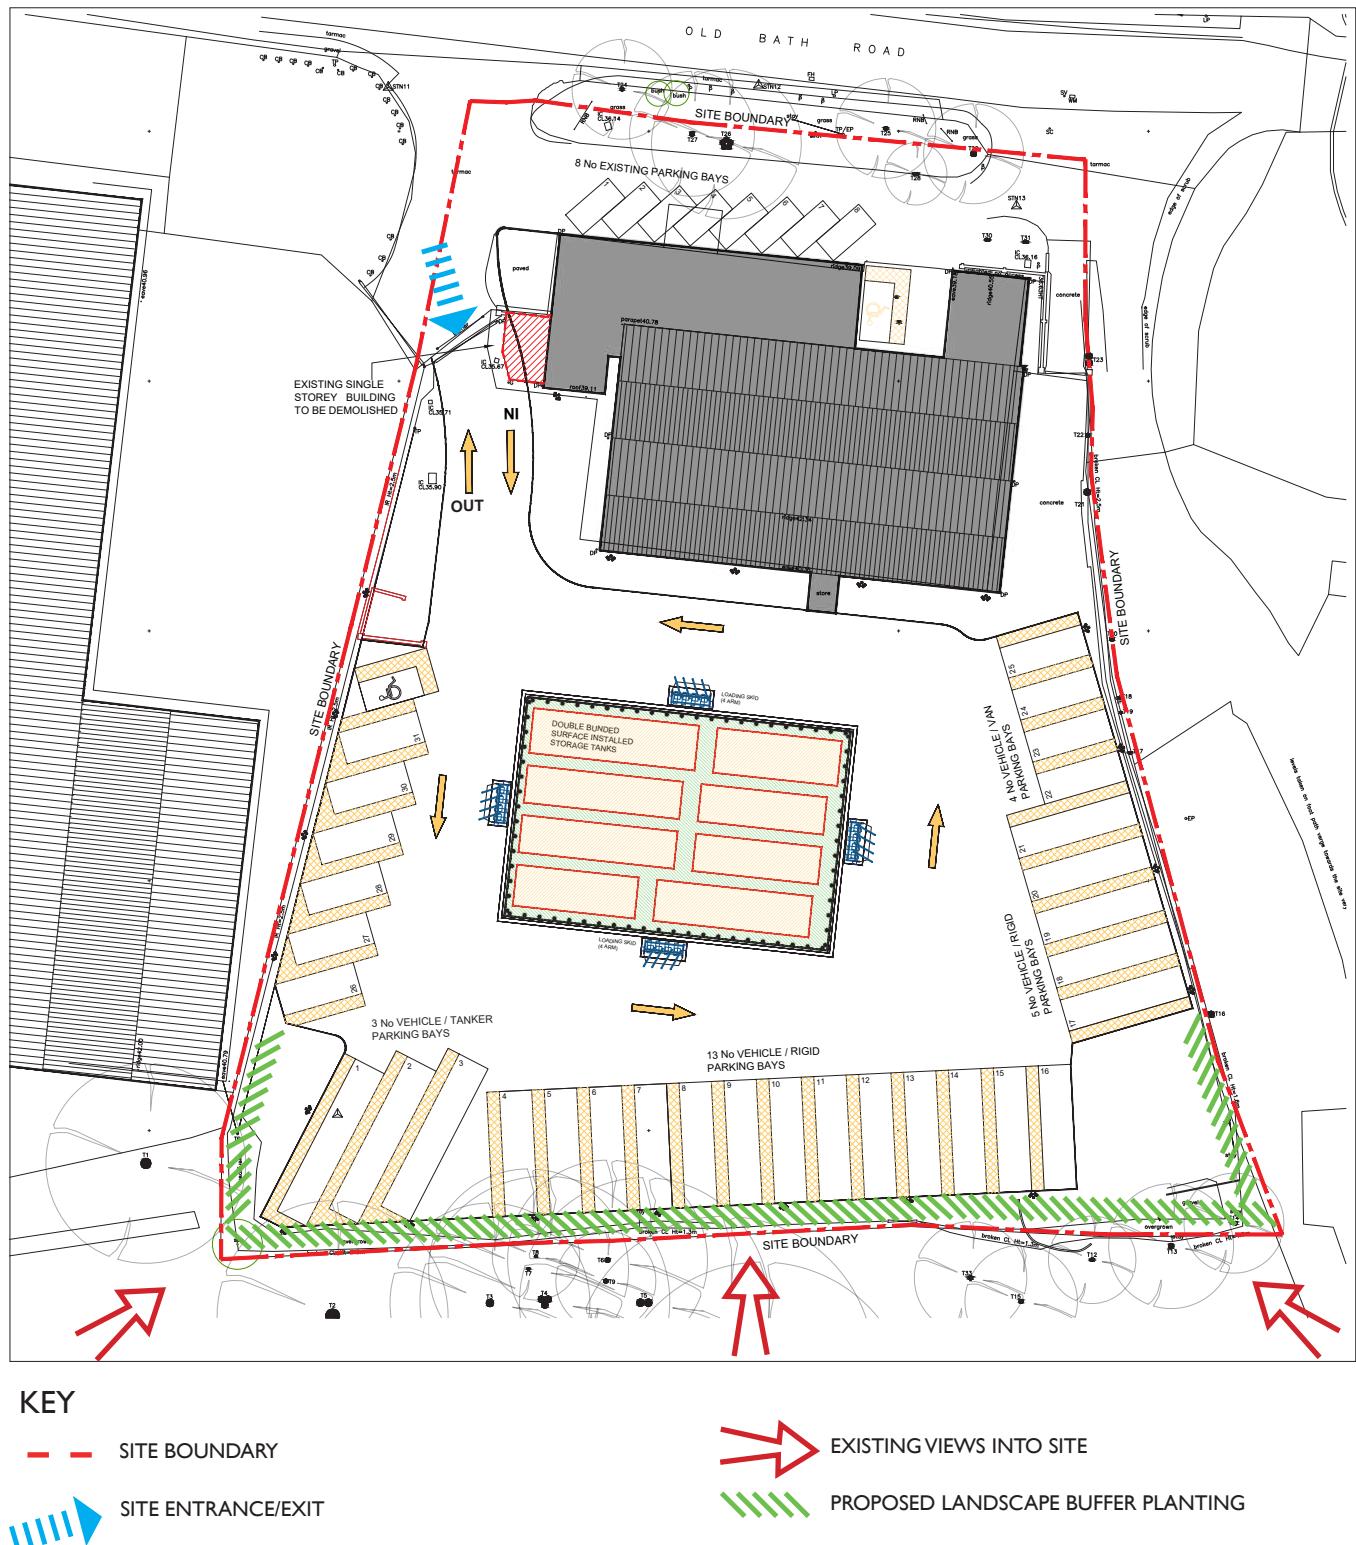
LANDSCAPE FRAMEWORK PLAN
